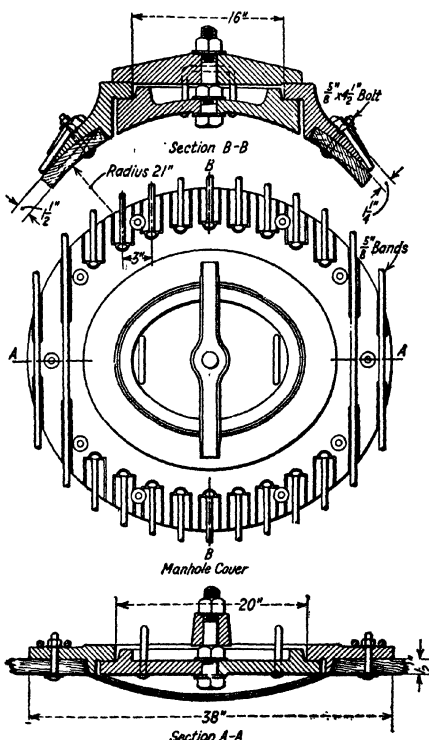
Cast Iron Manhole for 42-in Wood Stave Pipe, F. C. Kelsey, Consulting Engineer, N. Y. C.
